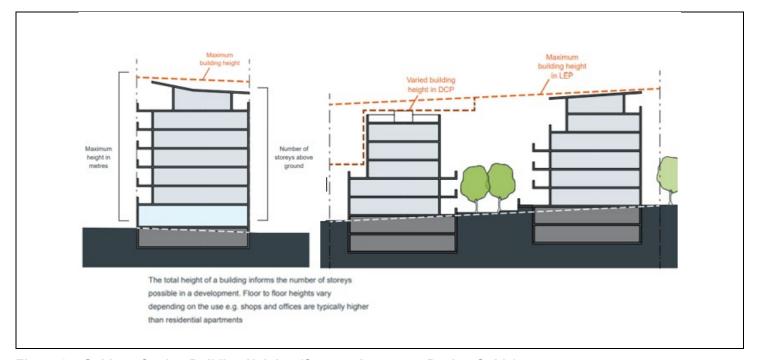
Guide to Setting Building Heights (Source: Apartment Design Guide)
